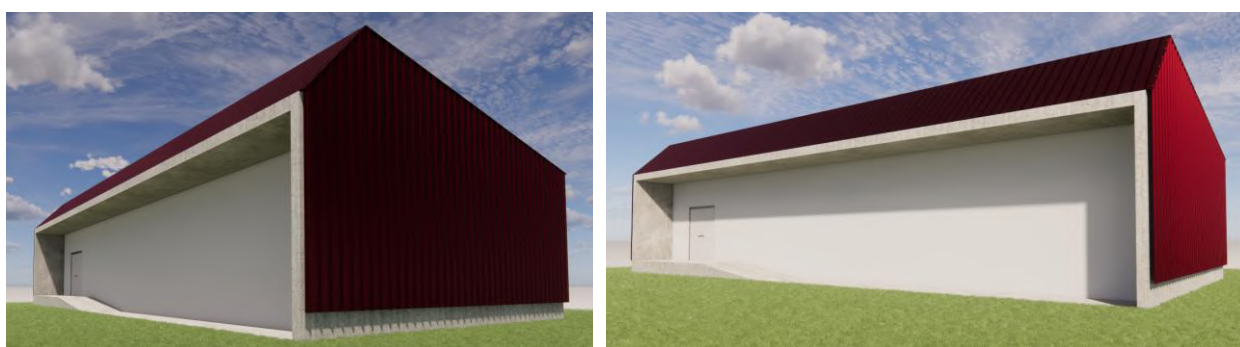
Perspective views of the entrance facade enclosed with an eave and side facade walls
